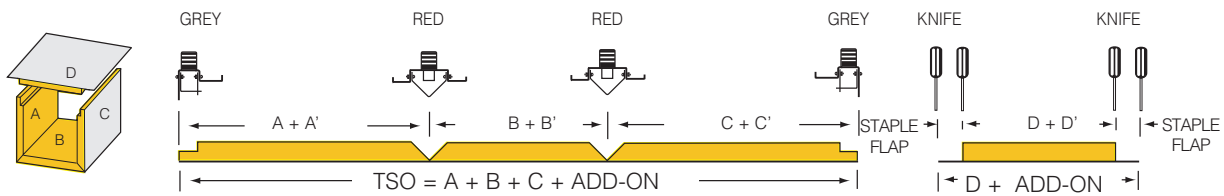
Fabrication – Two-Piece U-Style Duct
